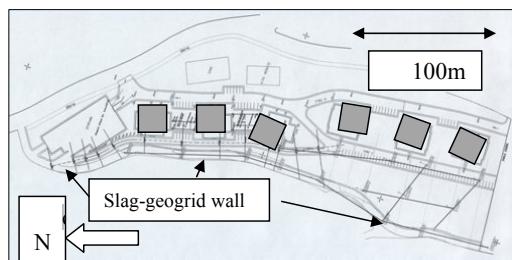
The plan view of the site (The slag-geogrid wall is located at the W side of the valley)
